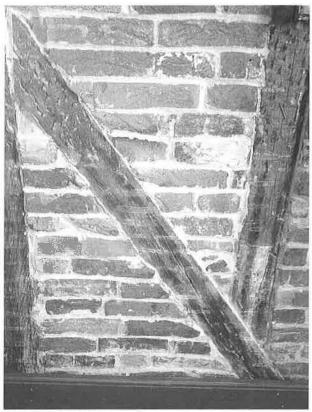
Detail of half timbering with brick nogging at interior of Zoar Canal Inn (1832).
